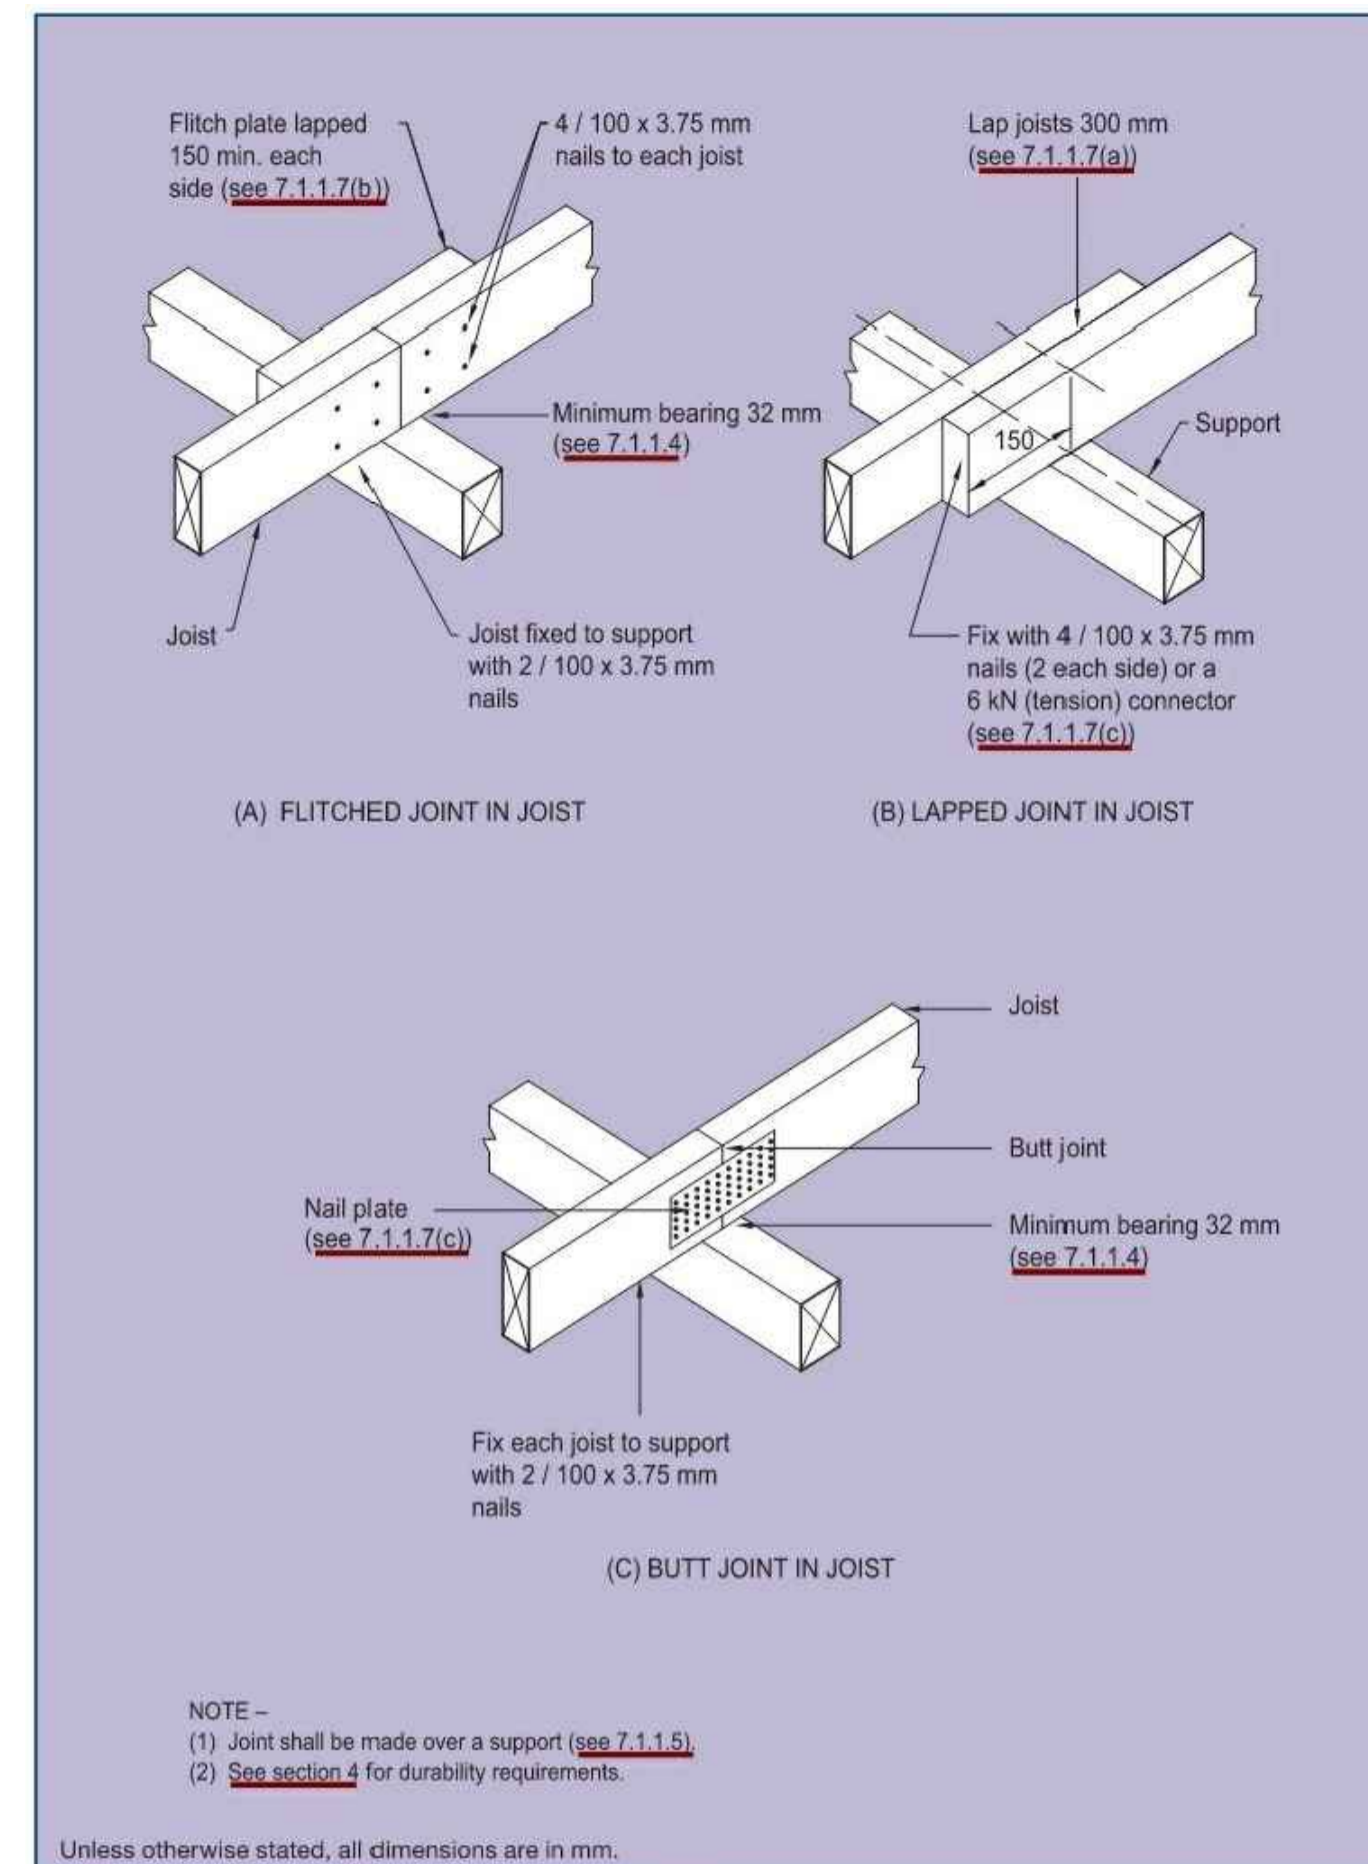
Lapped or butted joints in floor joists (see 7.1.1.7)
